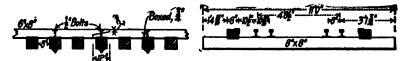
Bridge Floor and Guard Rails; New York, New Haven & Hartford Ry.
